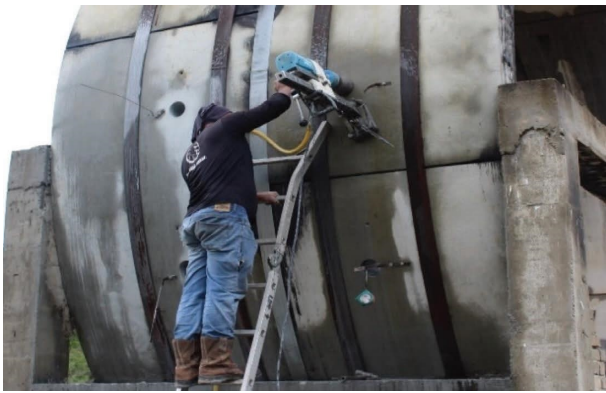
Drilling cores in the full-scale segments for MYC and SPC concrete.
